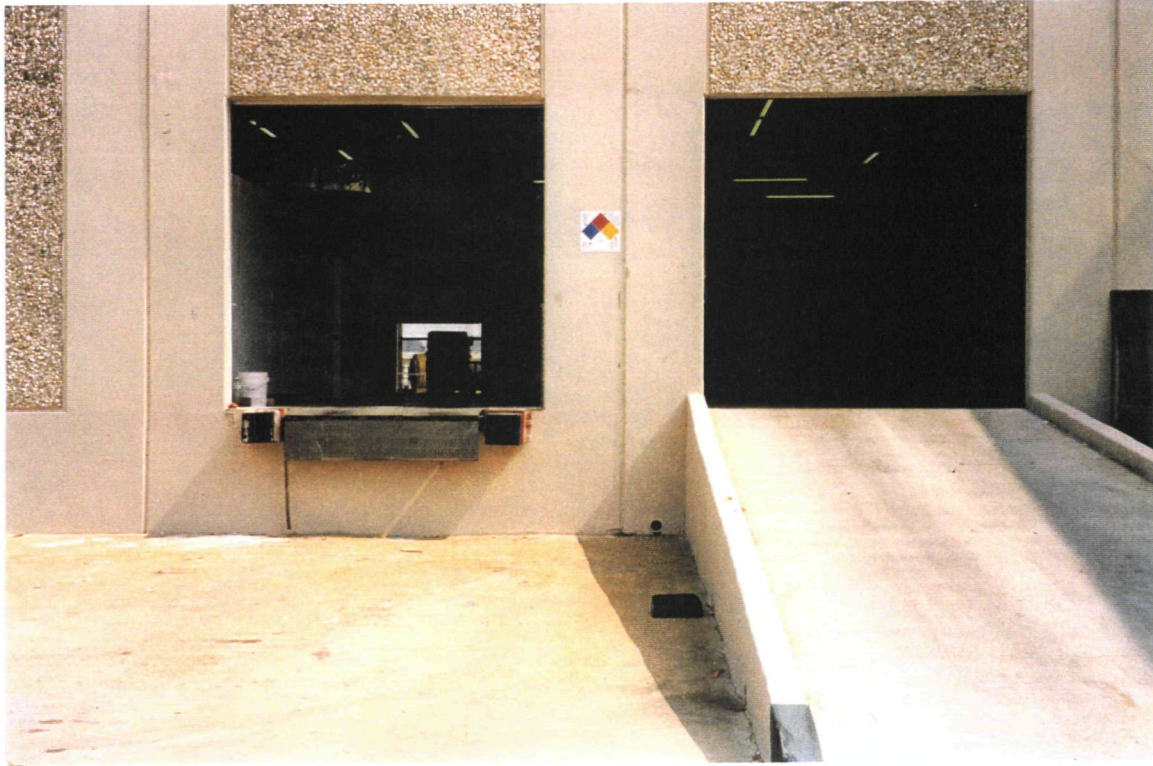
7/26/00. Photographer Melissa Cordell, TNRCC. Facing north.
